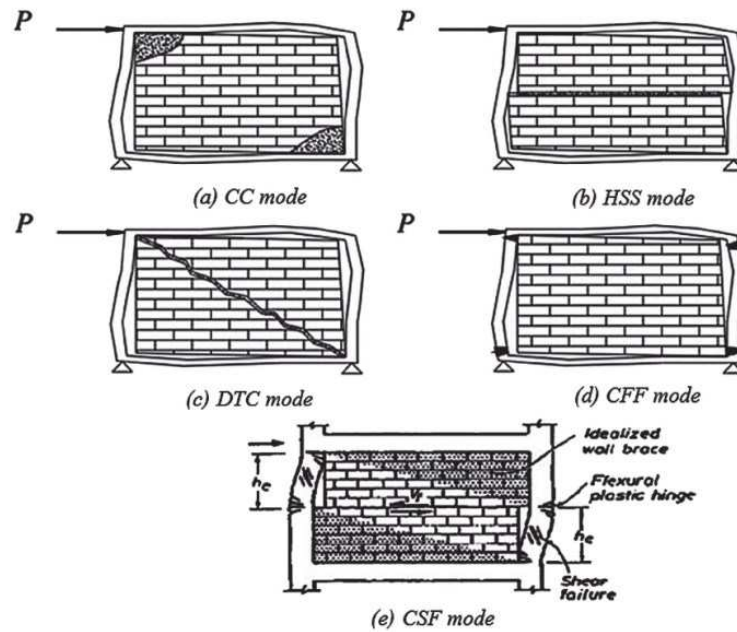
In-plane failure modes of infilled frames: (a) corner crushing (CC) mode; (b) horizontal sliding shear (HSS) mode; (c) diagonal tension cracking (DTC) mode; (d) column flexural failure (CFF) mode (El Dakhakhni et al. 2003); and (e) column shear failure (CSF) mode (Paulay & Priestley 1992).
